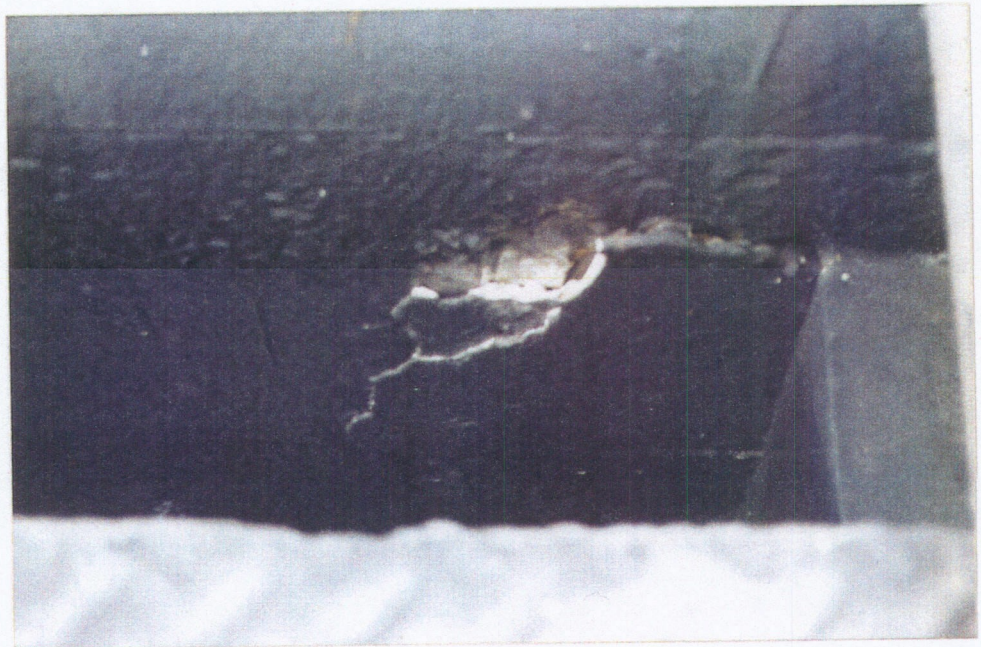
DELAMINATED CONCRETE NEAR THE EAST GATE HINGE RECESS. THE SHEET OF CONCRETE HAS SEPARATED SINCE INSPECTION NO. 4. NO CORRSION IS EVIDENT.
